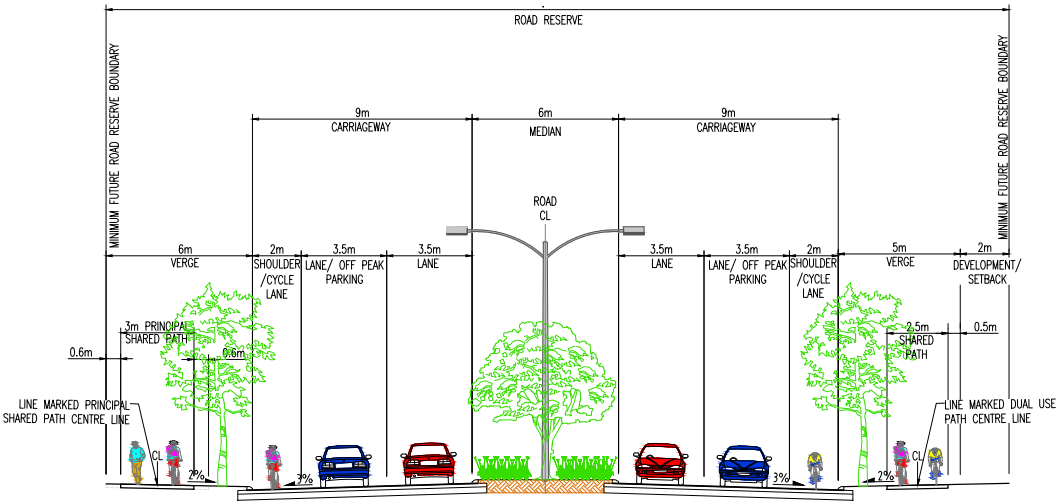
CROSS SECTION ELLIOT ROAD (DISTRICT CENTRE)
